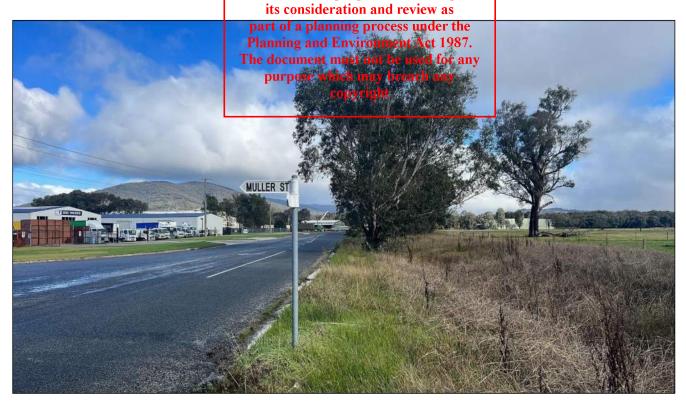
Sight distance at the proposed site access along Baranduda Drive facing southwest
